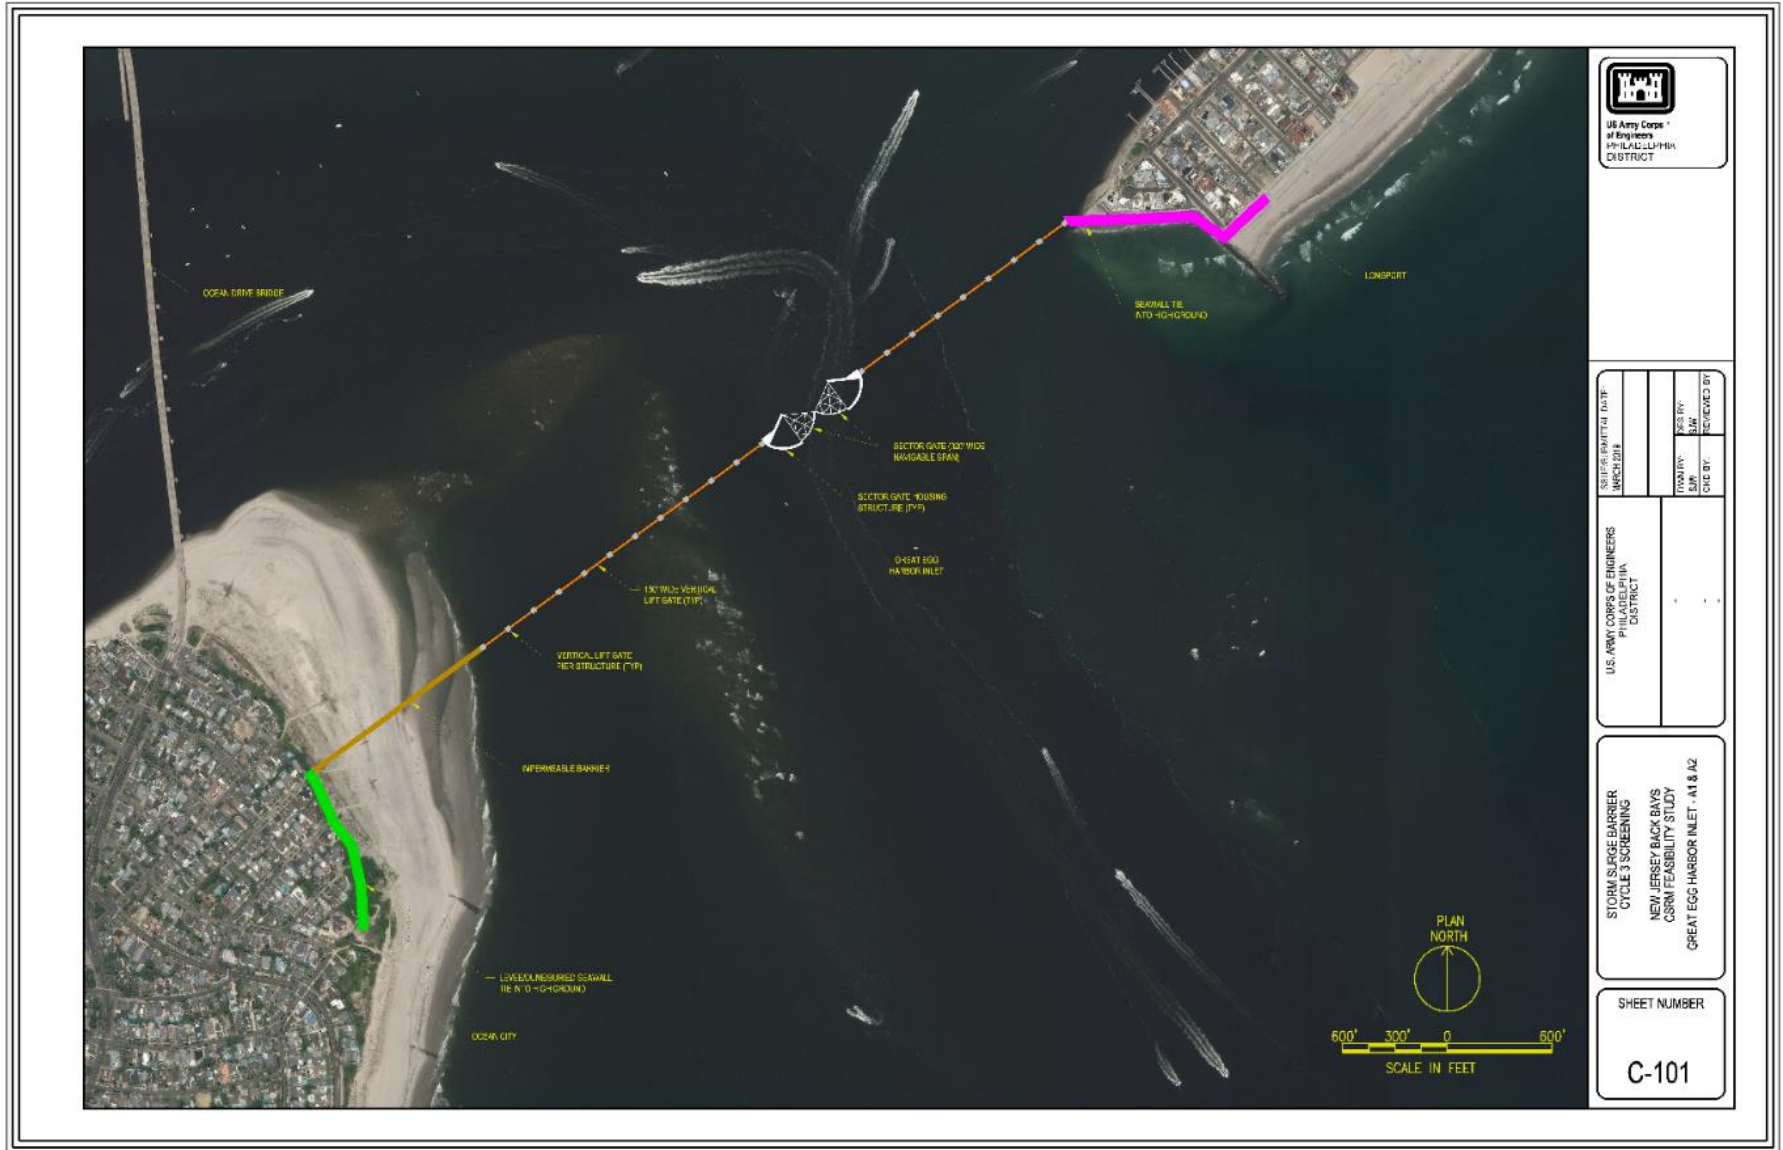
Great Egg Harbor Inlet SSB Plan View Layout
